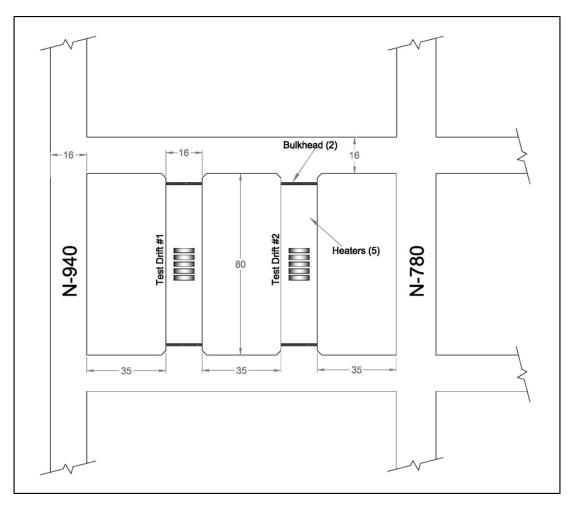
Plan view of the layout of the proposed field-scale thermal test
